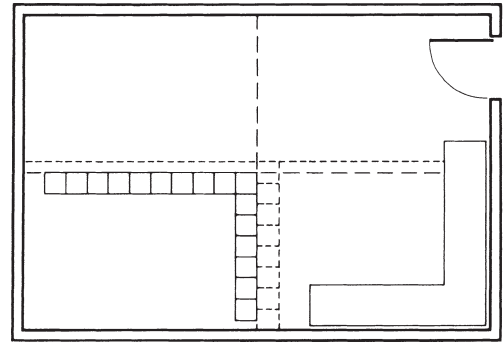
Adjust tile layout at center lines if less than one-half tile at walls.
